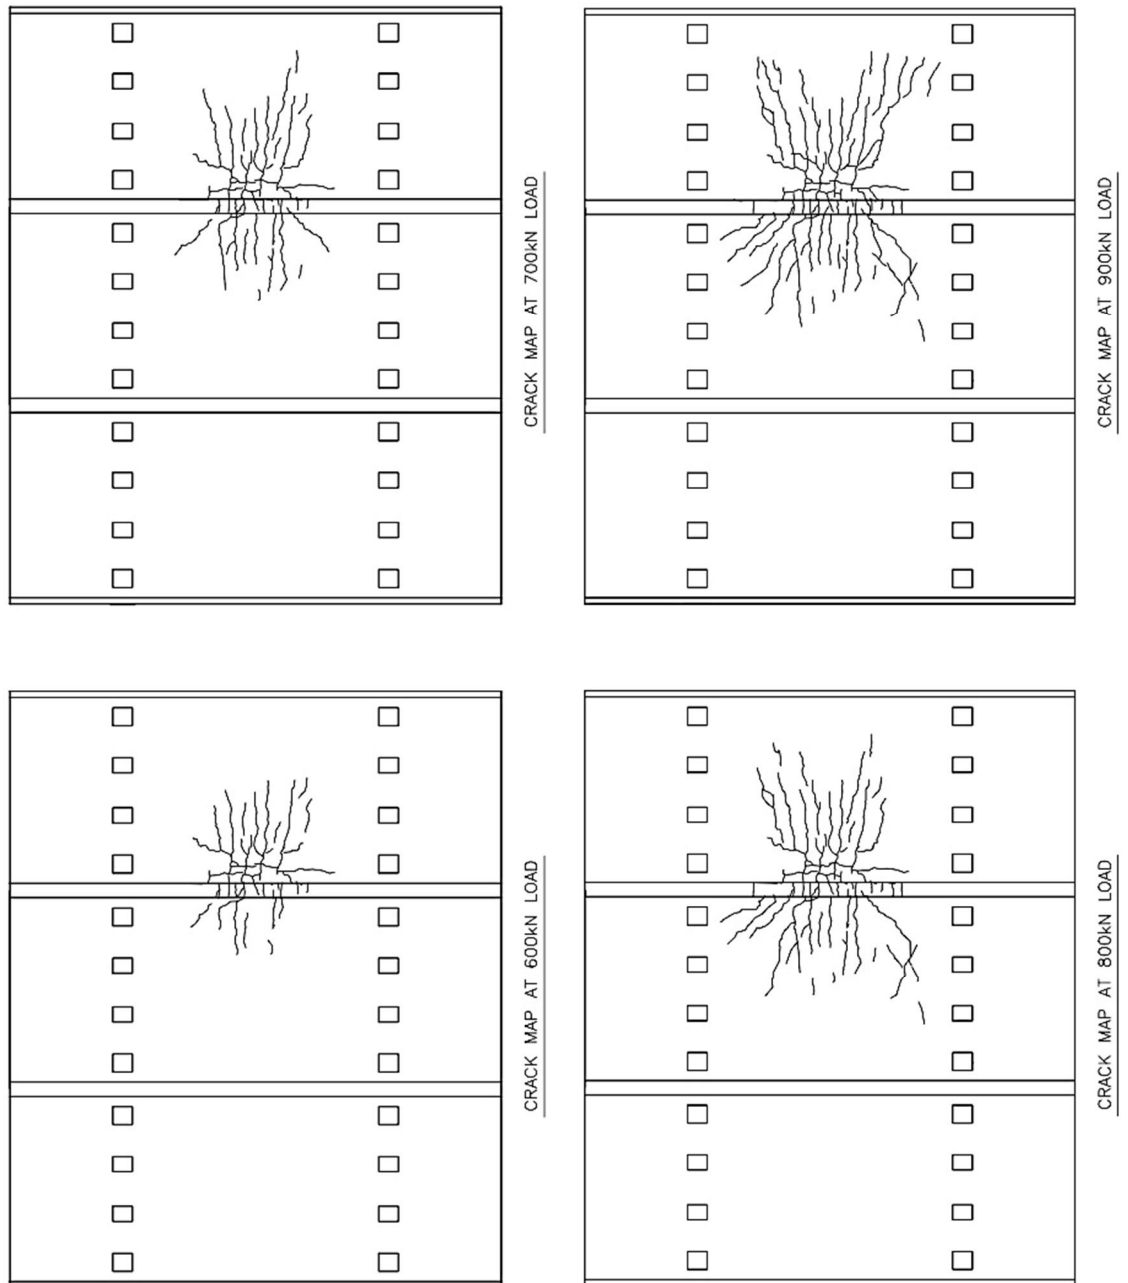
Crack Progression from 600 kN to 900 kN (Test #4)
